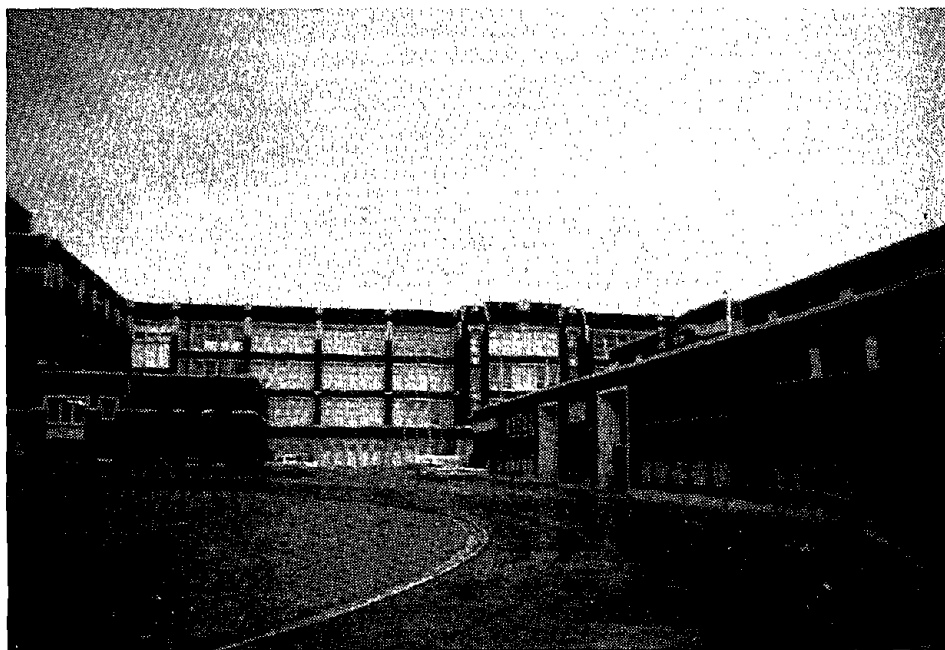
URM PUBLIC SCHOOL BUILDING,
